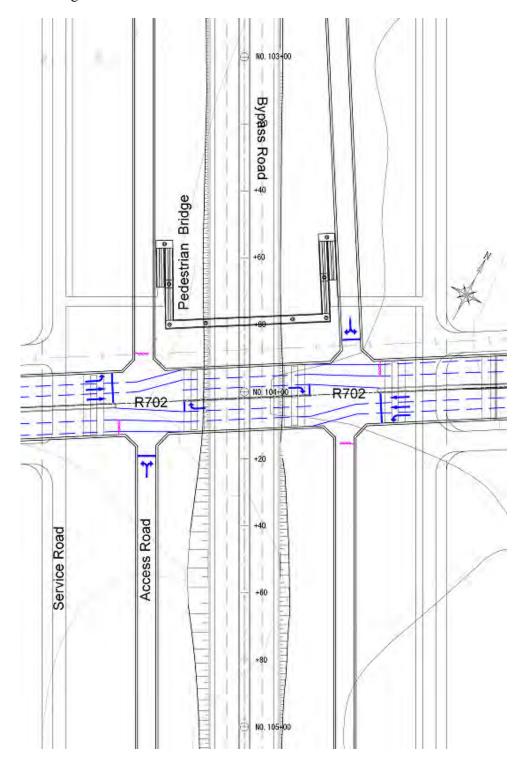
Traffic Lane Configuration at the Flyover Bridge for connecting with R702 and Project Road
